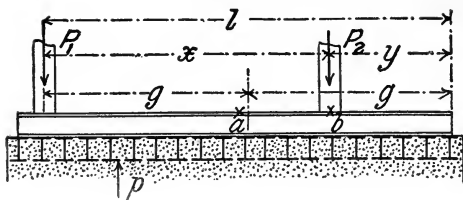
Diagram of Combined Footing, Two Unequally Loaded Columns, Area Rectangular.
